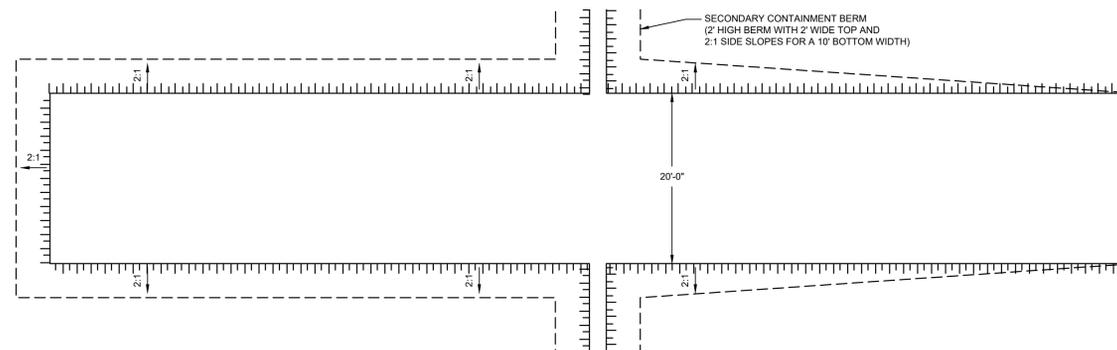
TEMPORARY ACCESS ROAD/ RAMPS
